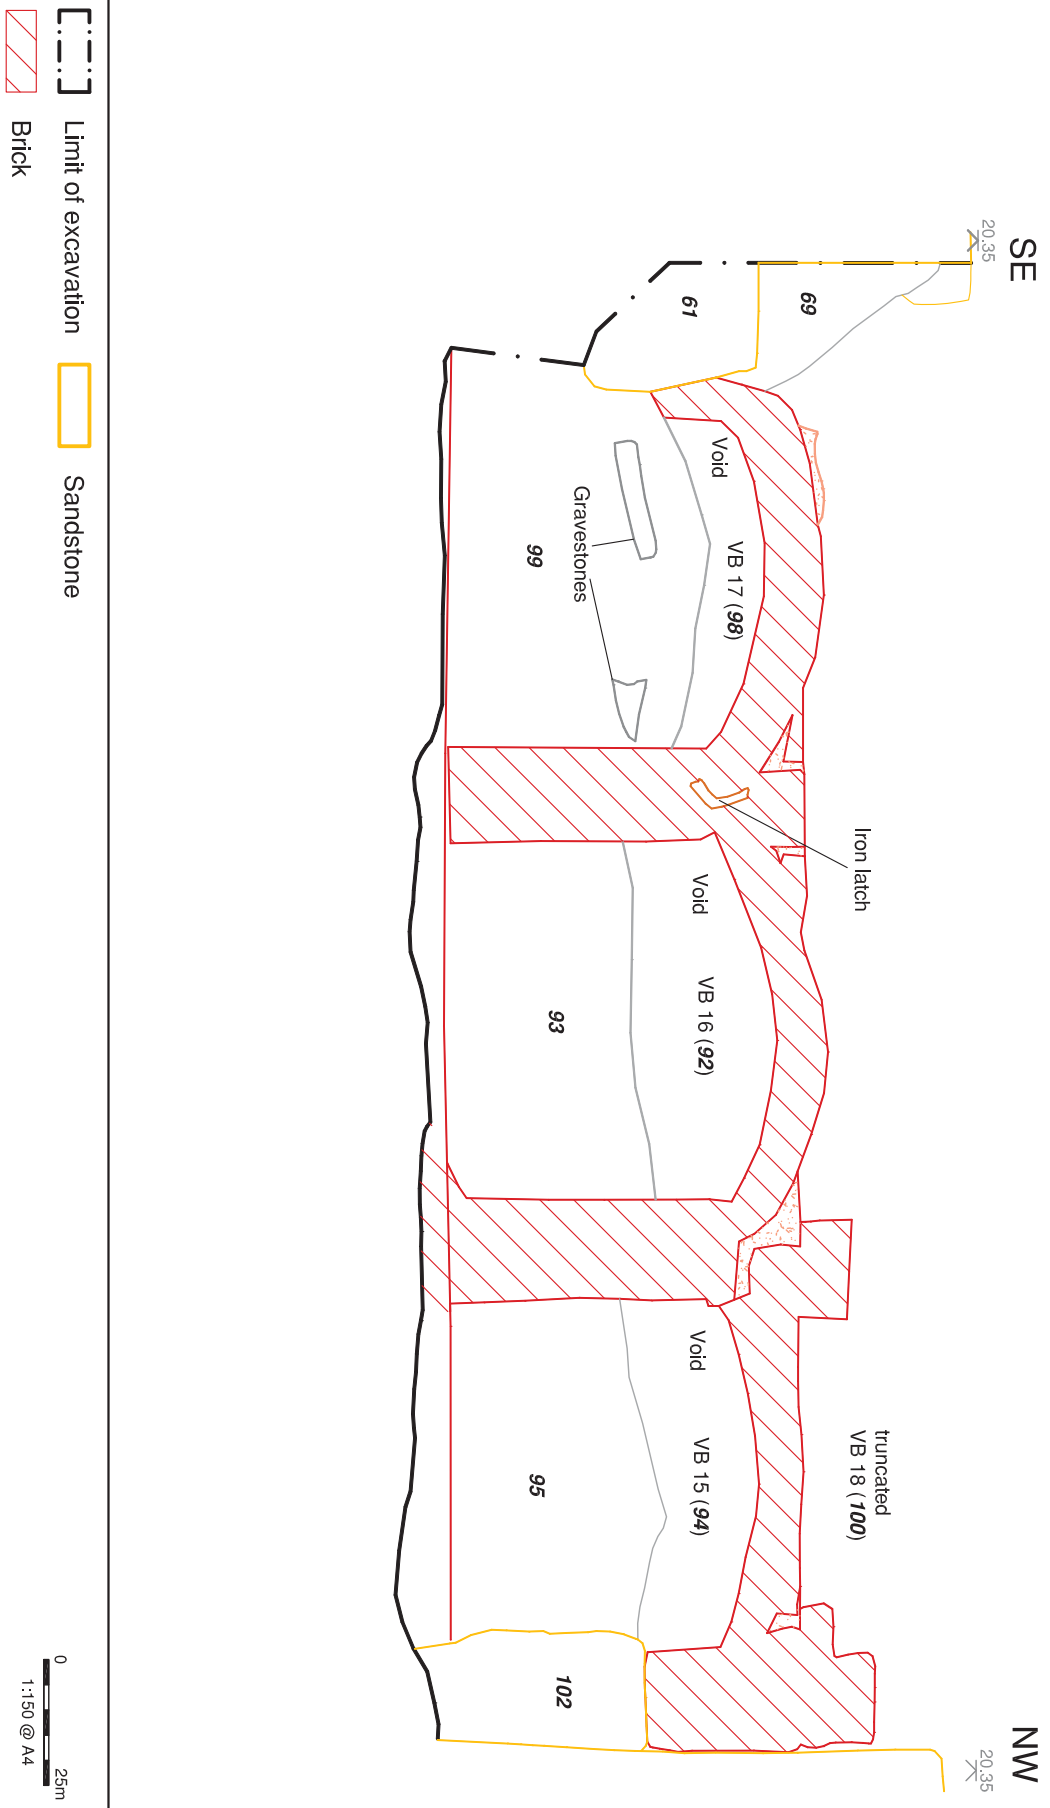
North-east facing section of vaulted bays 15-18 within the church crypt
